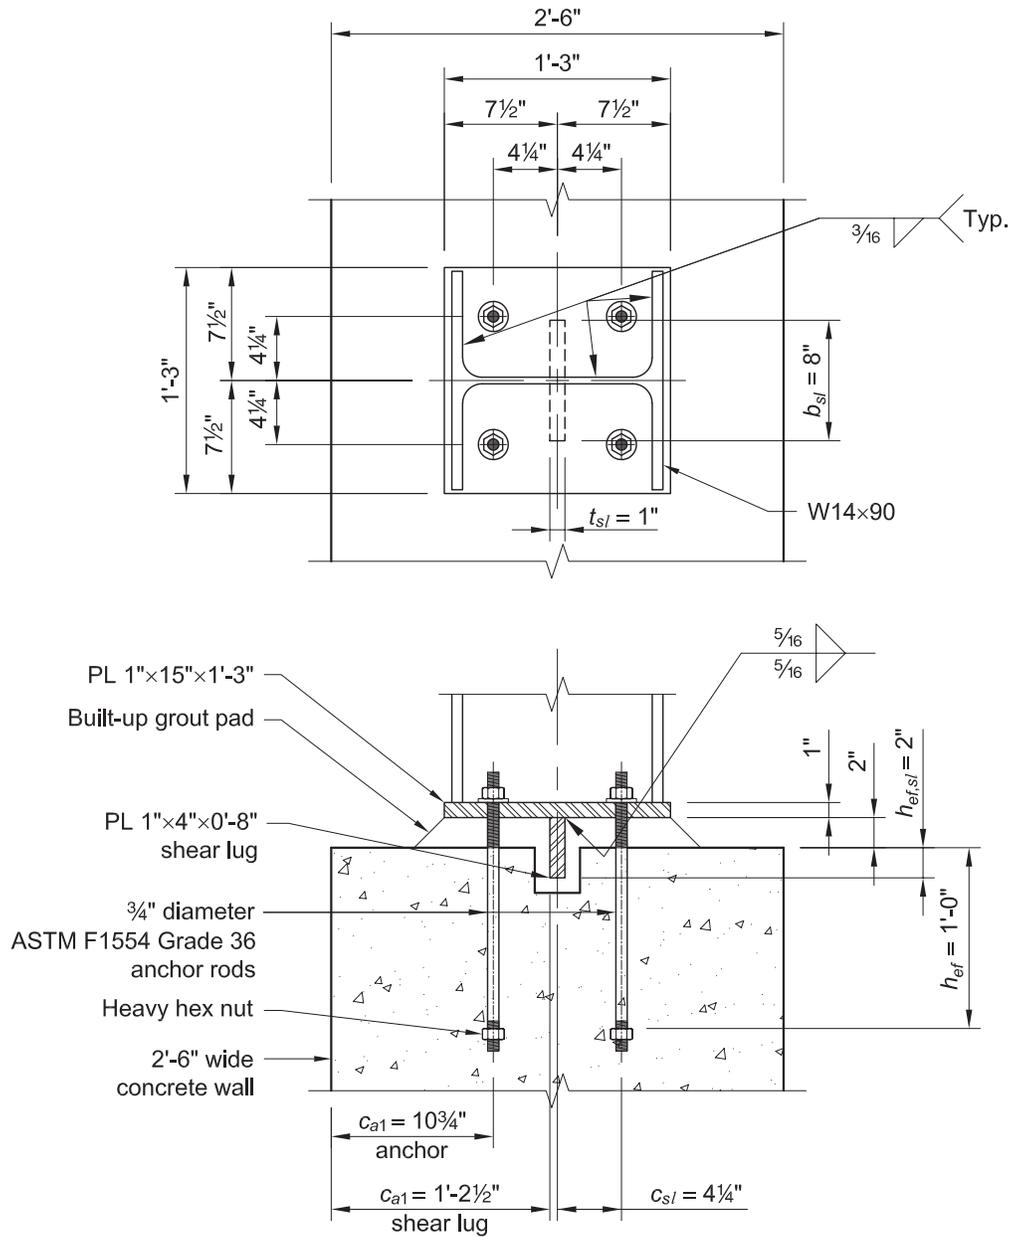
Base connection as detailed in Example 4.7-5.
